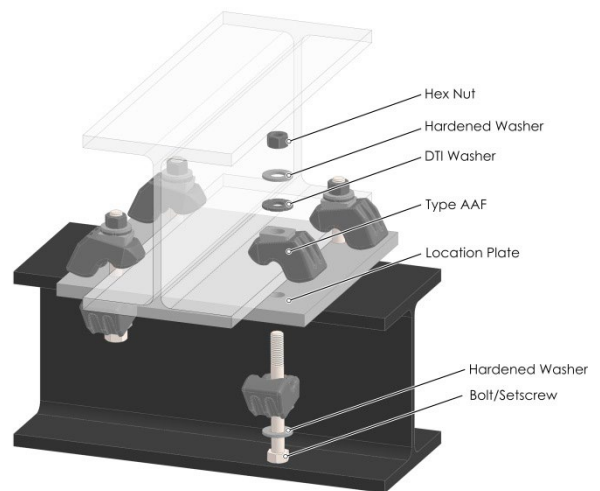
GIRDER CLAMP CONNECTION WITH LOCATION PLATE (TYPE AAF CLAMP / DTI BOLT ASSEMBLY SHOWN)
